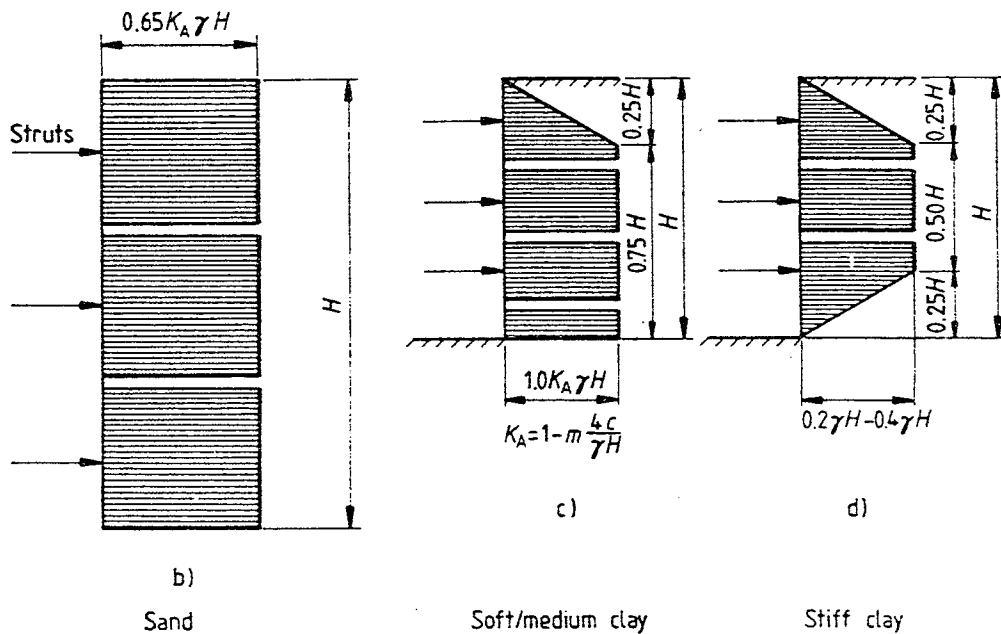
Active pressure diagrams relating to maximum strut loads in braced earth retaining structures
